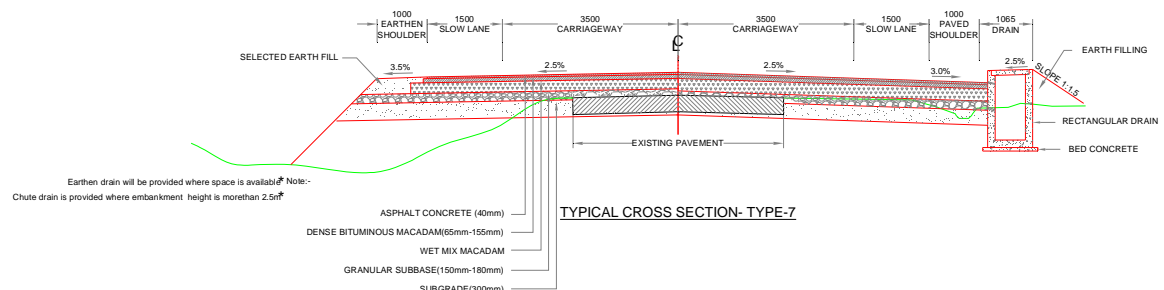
TYPICAL CROSS SECTION- TYPE-7
